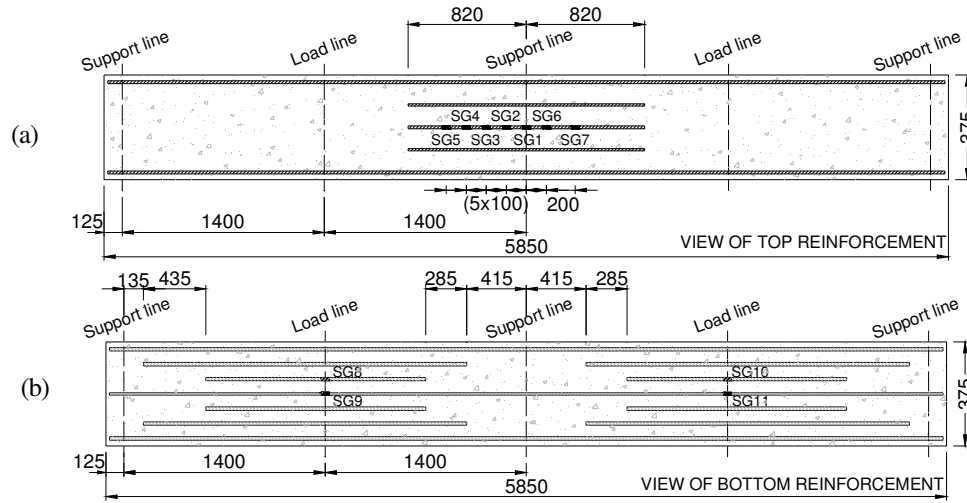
Arrangement of the (a-b) longitudinal steel of the SL45-H slab strip.
